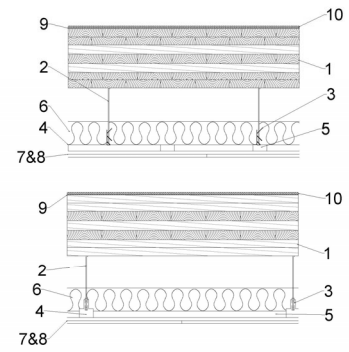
Structure drawings of floors C1–C4 based on the cross-laminated timber slab. The drawings are shown with better resolution in Ref. [17].
